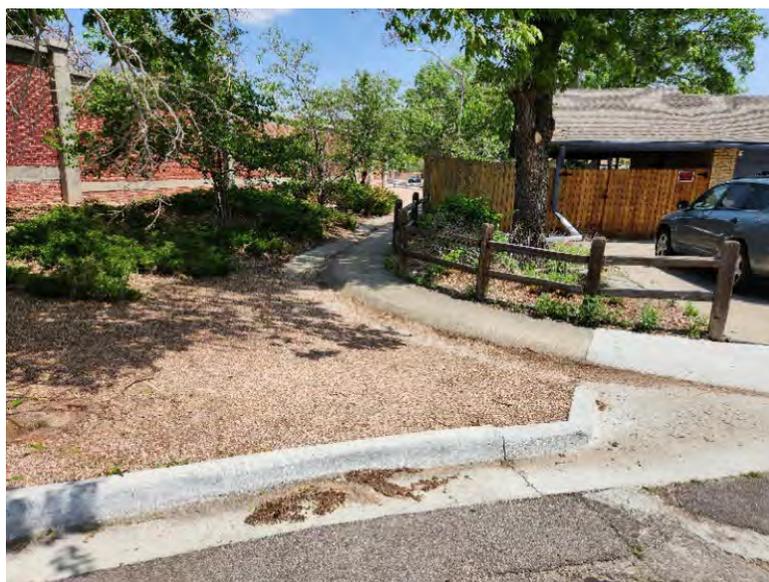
Dead end to sidewalk at the corner of Ingalls Street and 72nd Avenue Frontage Road
